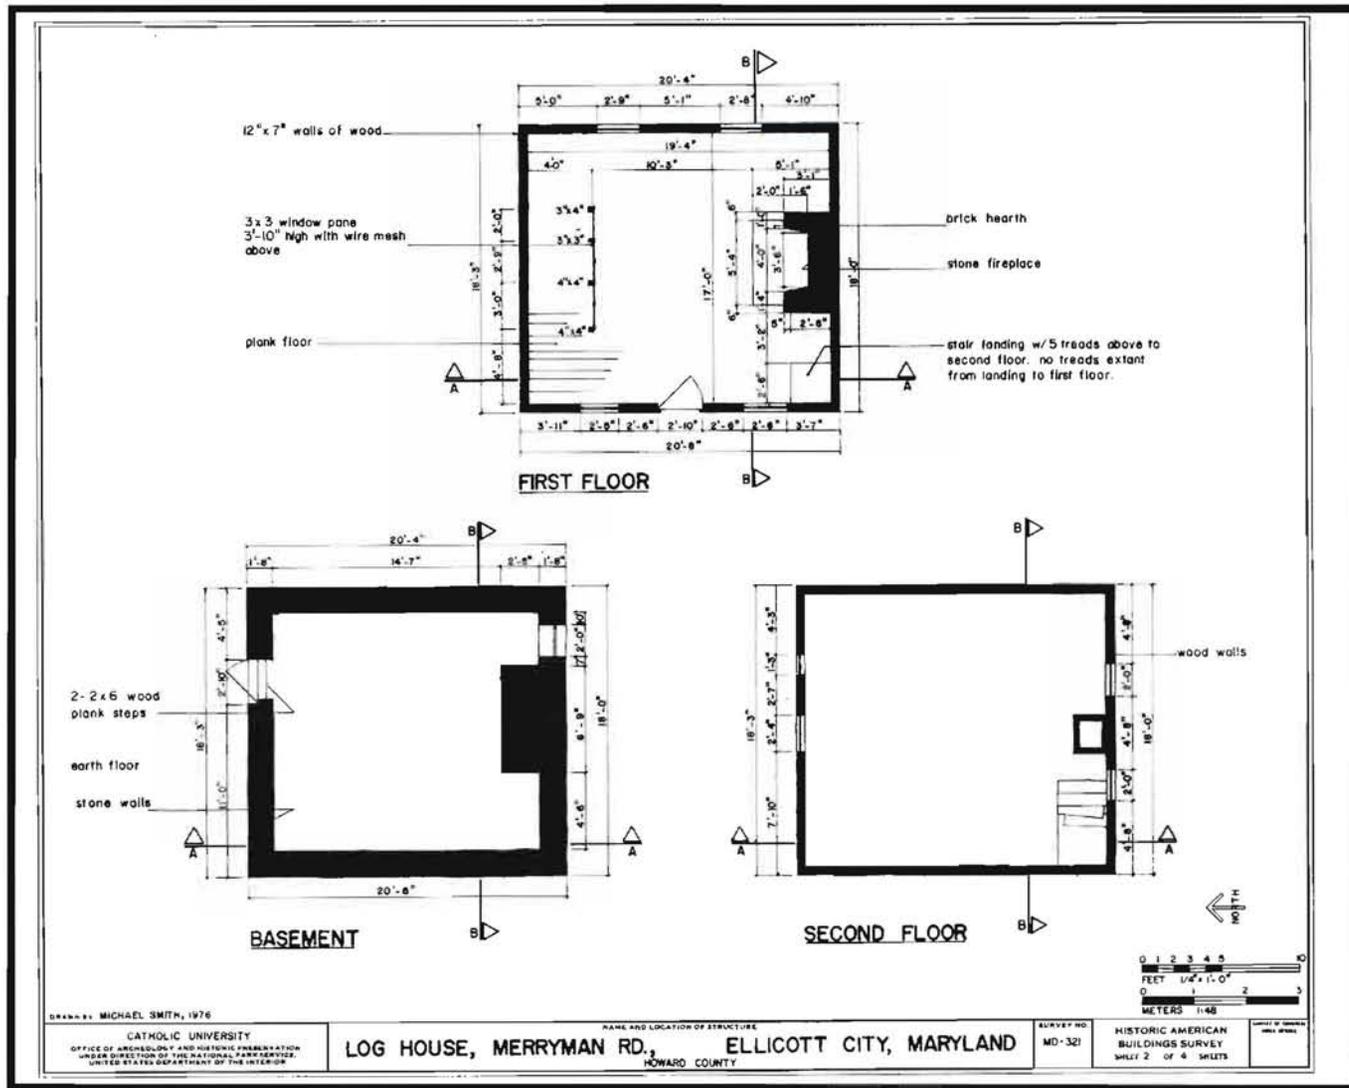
Drawing Depicting the Basement, First and Second Floor Plans of the Log House, Merryman RD, Ellicott City, Maryland. Many log buildings in this region were distinguished by a single room, or "pen," a one-room enclosure formed by four log walls (Source: Historic American Building Survey 1976).
